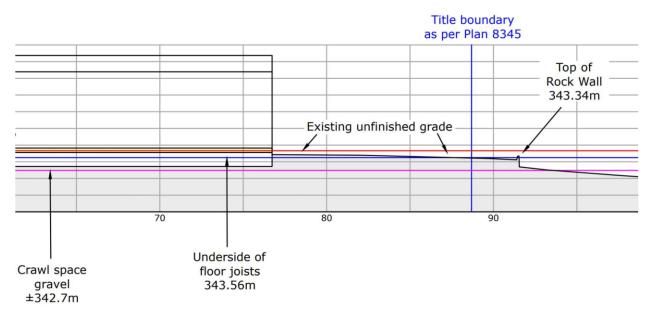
Flood Elevations at the Subject Property – From "Plan Showing Grades and Elevations for Lot 10" by Summit Land Surveying.
